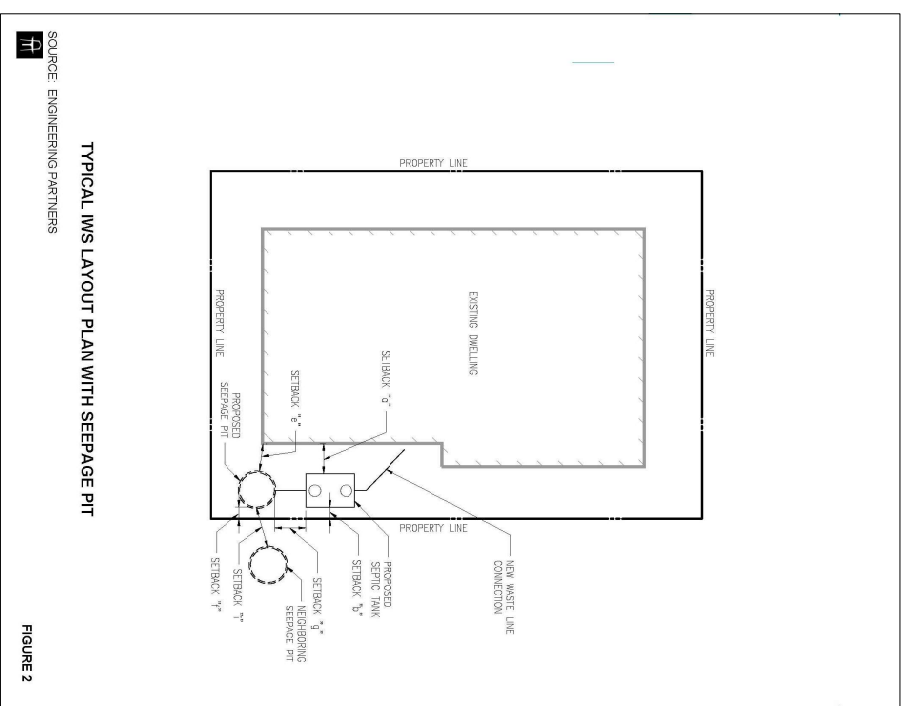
Typical IWS layout plan with seepage pit (courtesy of client)
